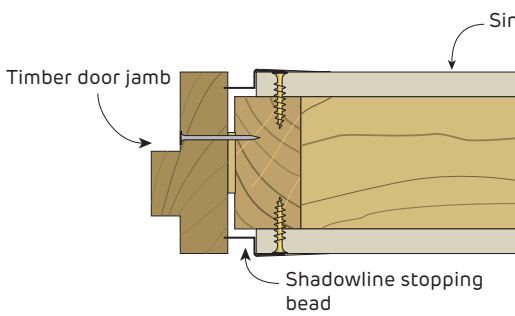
Typical Timber Door Jamb With shadowline stopping bead Plan
